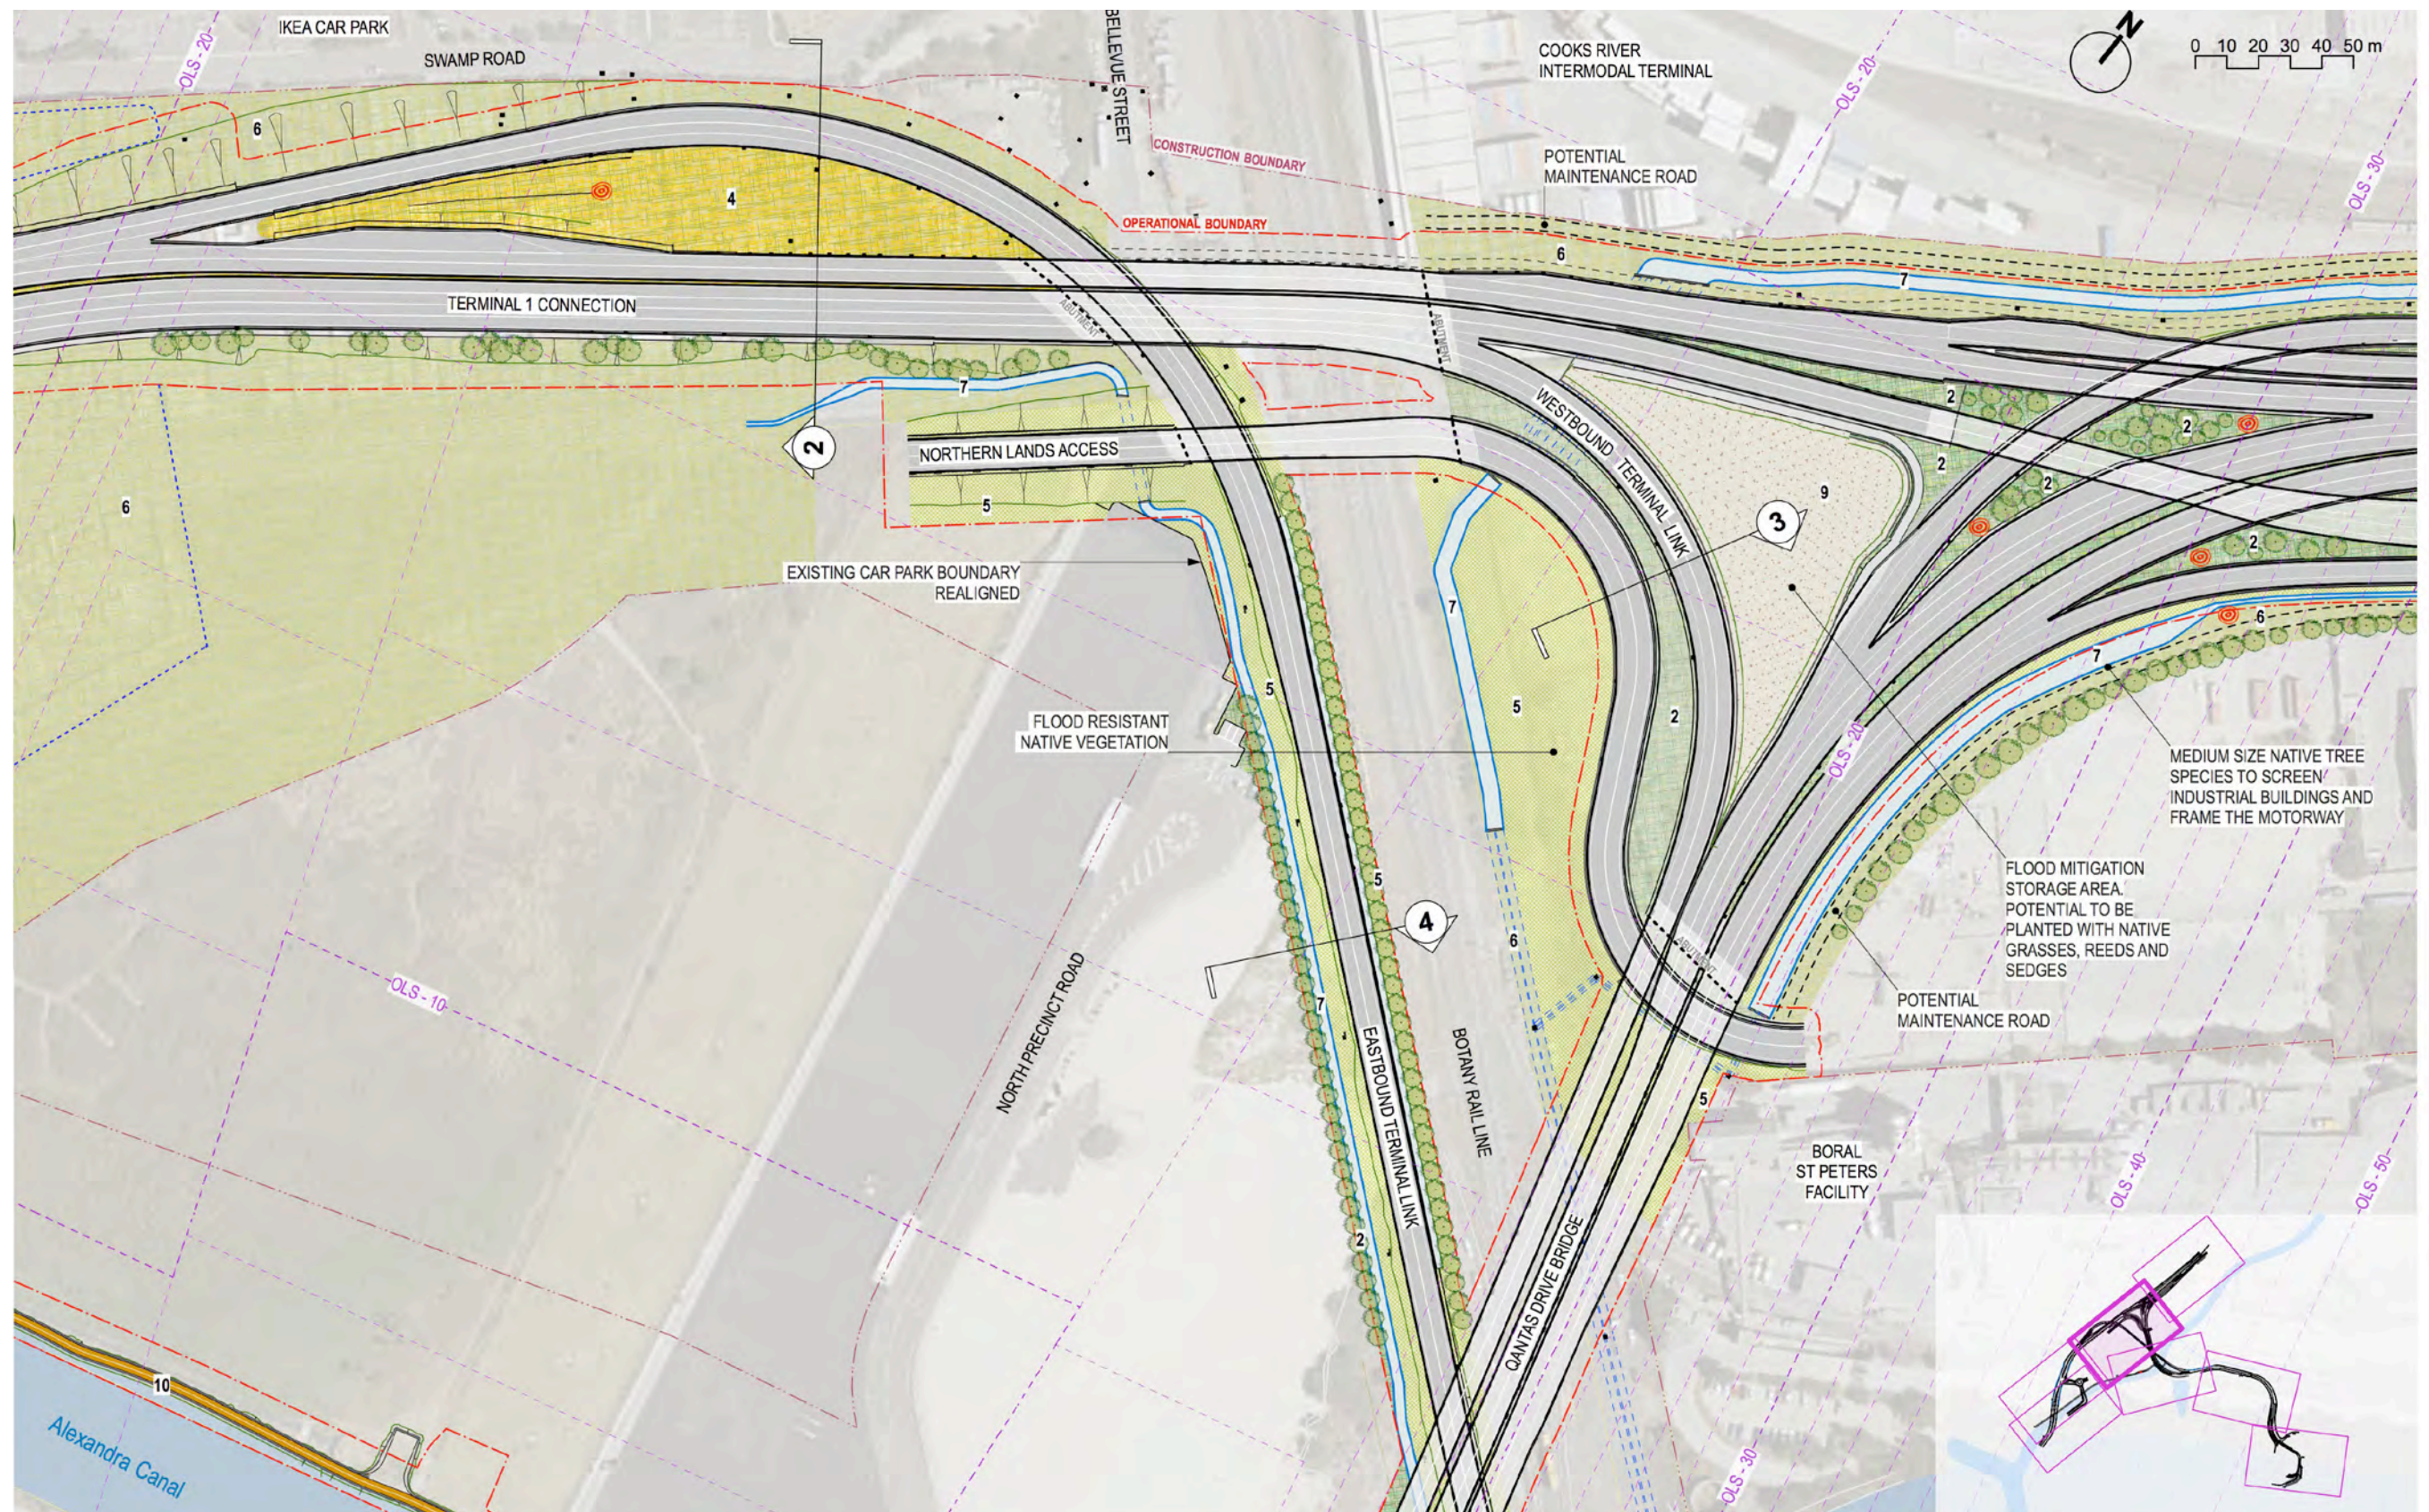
Urban and Landscape Design Concept plan - Precinct 3: Central interchange
